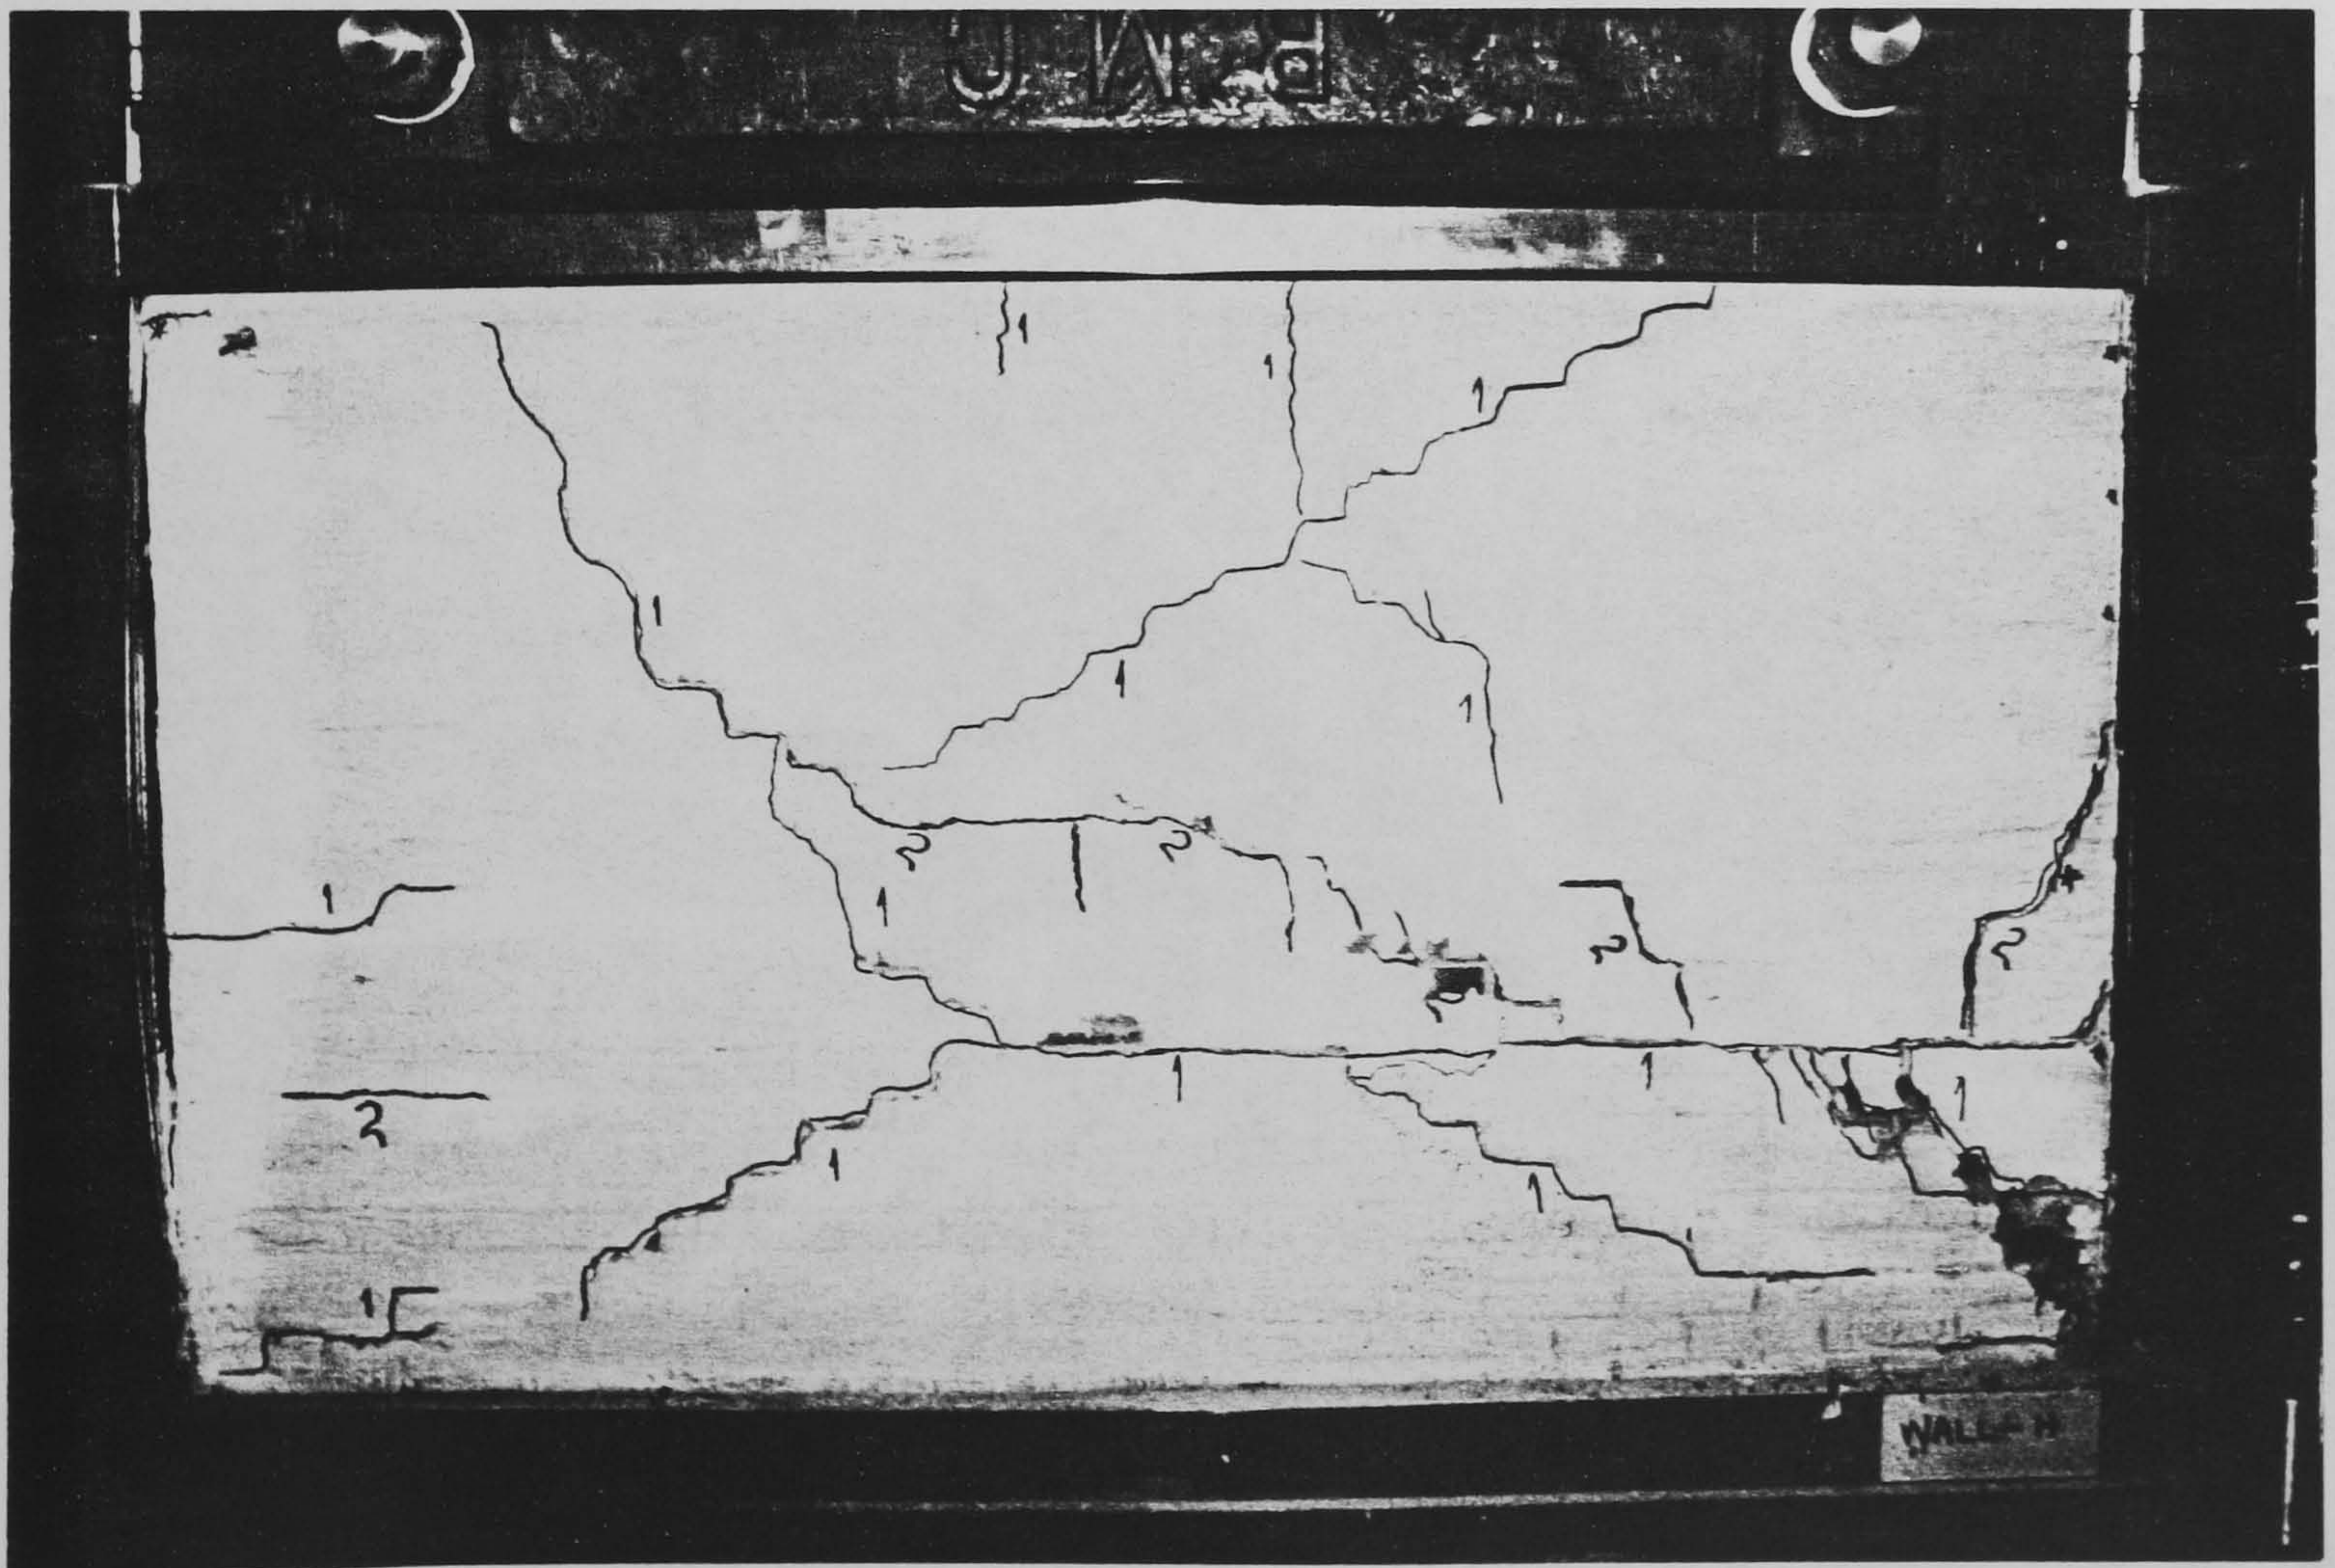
Collapse sequence-frame 1 (wall-H)
